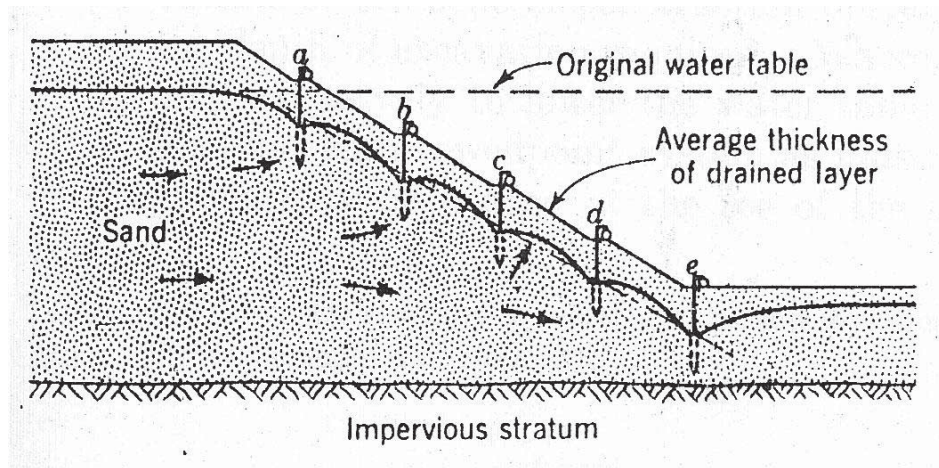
Multistage wellpoint system (Leonards, 1963)
